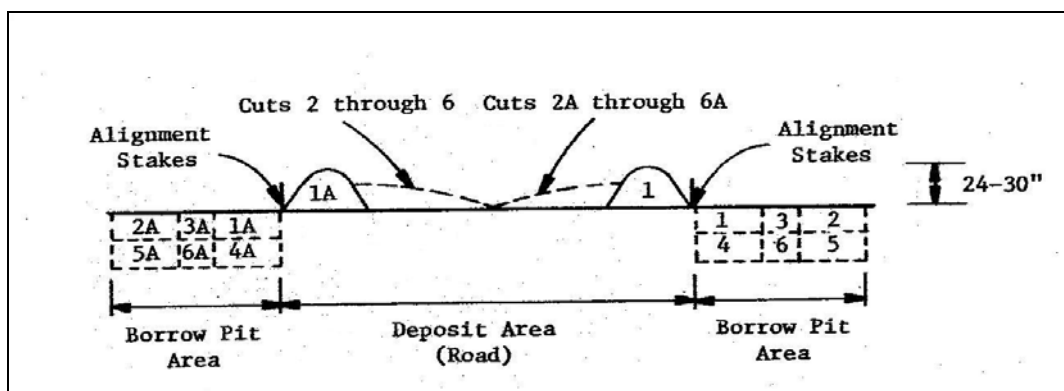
Cross section showing sequence of passes for elevating snow roads with a snowblower (Barthelemy 1975a)
